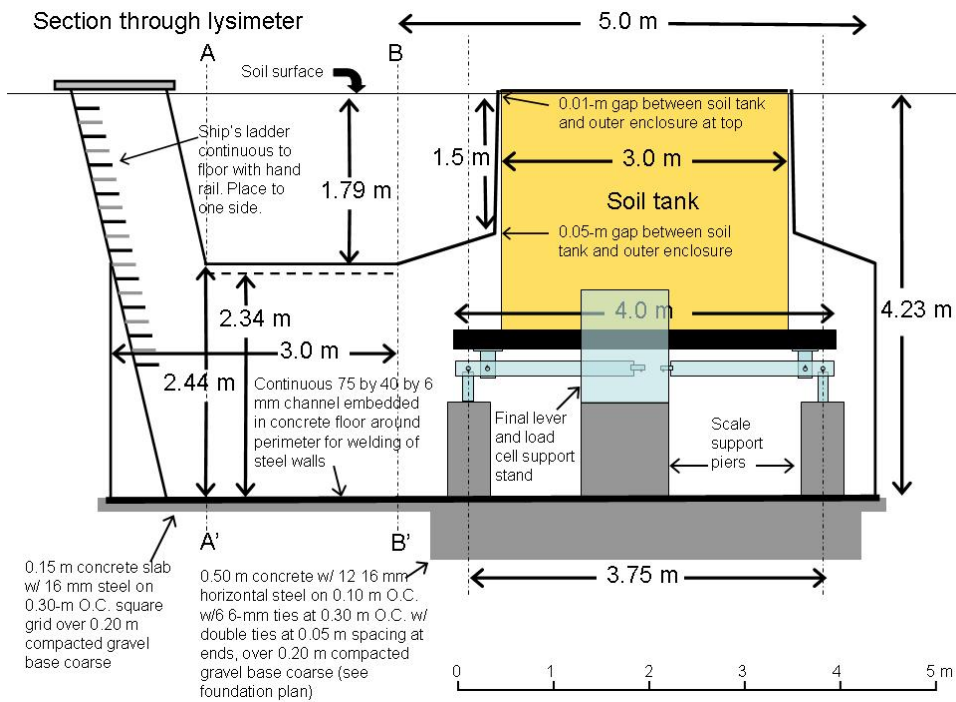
Cross-section through lysimeter showing soil tank, outer enclosure, access way to entrance tunnel, and hatch. Not all items shown are in the same plane. The foundation and slab, steel channel in slab, scale support piers, scale, final lever and load cell support stand, main girder, and soil tank are not in the plane of the cross-section but are shown for completeness. Roof support columns and horizontal and vertical reinforcing I-beams are not shown. The scale mechanism is shown in blue, the soil tank in yellow.
